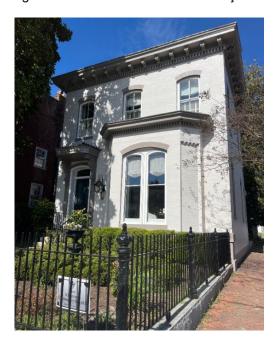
2720 East Broad Street. Primary Entrance. Location of new balustrade.
